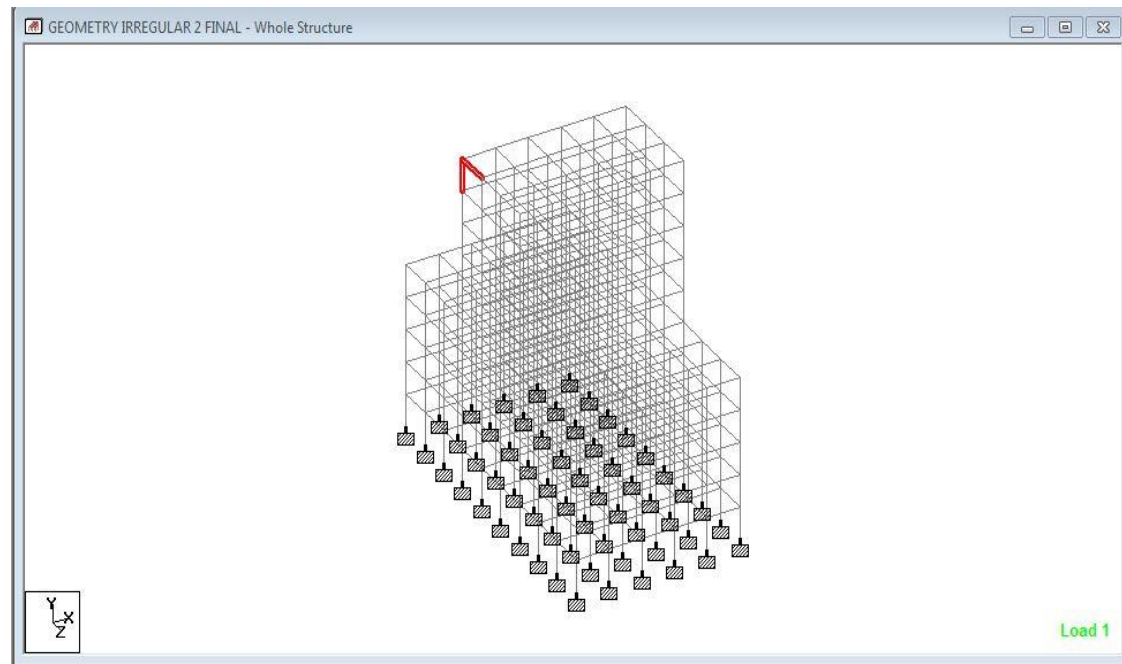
3-D view of a 10 storey mass irregular structure with highlighted beam and column
